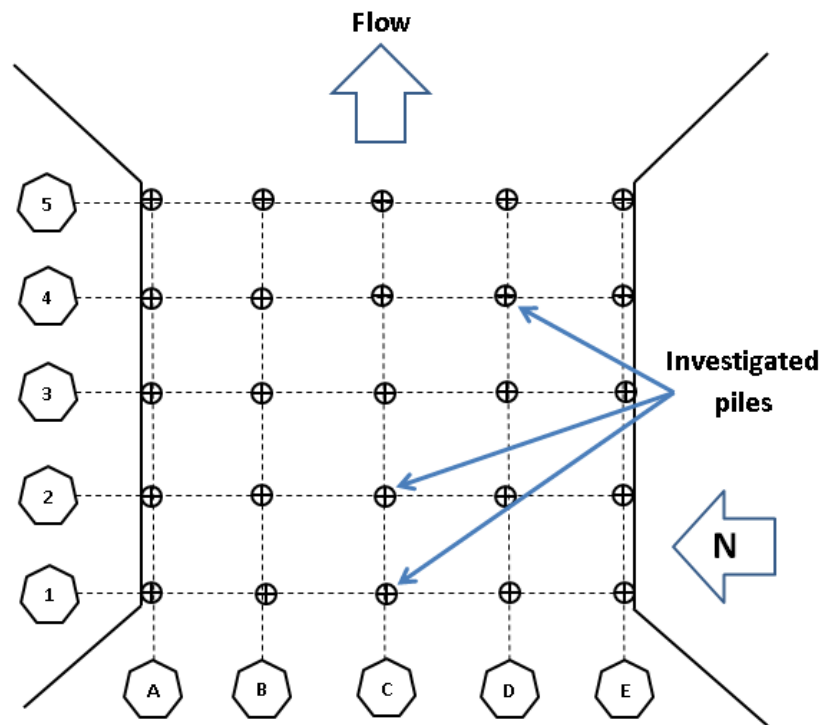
Foundation Plan and Investigated Piles of Bridge No. 1676
